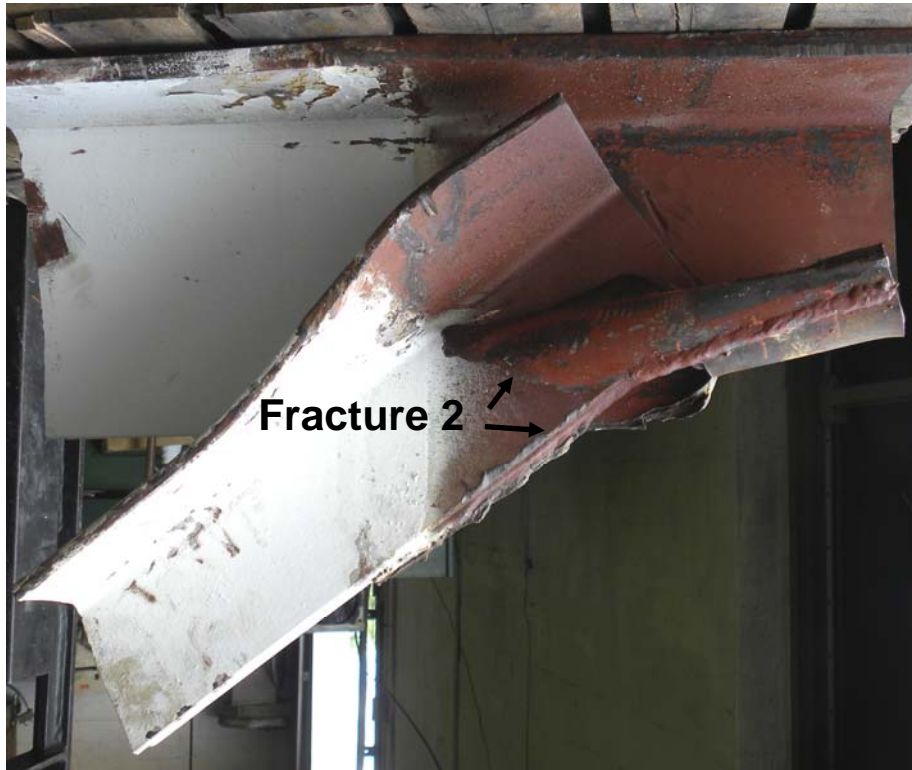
Top truss member as viewed from the sides. Arrows point to Fracture 2 on weld.
